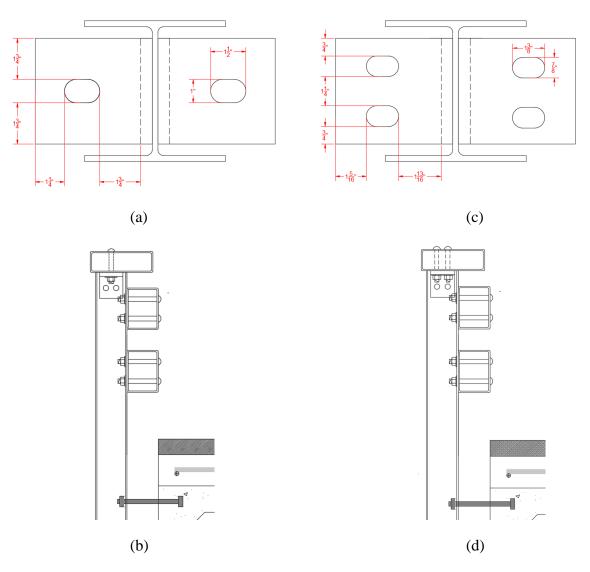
Top Rail Double-Angle Bracket Concept - (a) Plan View Option 1 without Top Rail, (b) Side View Option 1, (c) Plan View Option 2 without Top Rail, and (d) Side View Option 2
